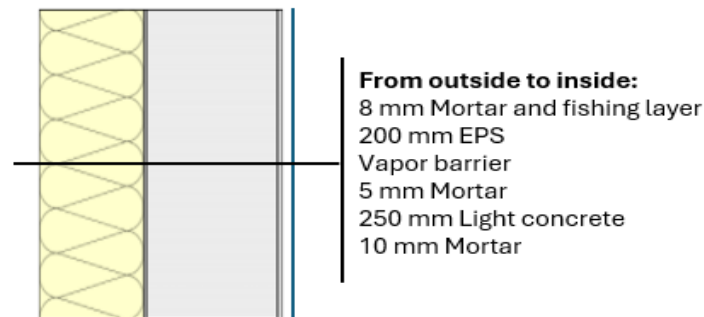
Details of proposed exterior concrete wall at Byalagsgatan 8.
